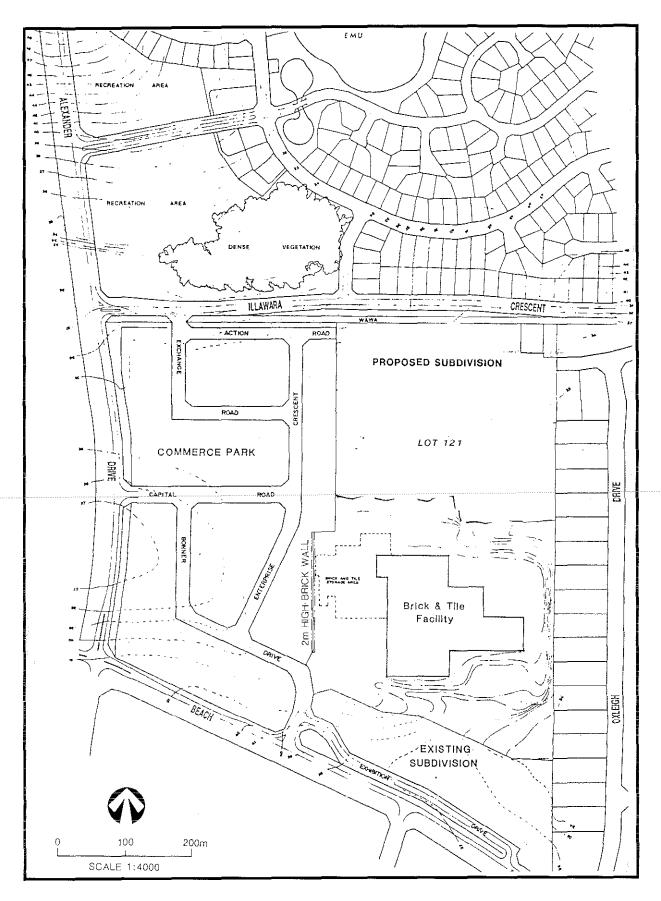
Location plan of IBT Brick and Tile Works and proposed subdivision at Malaga
